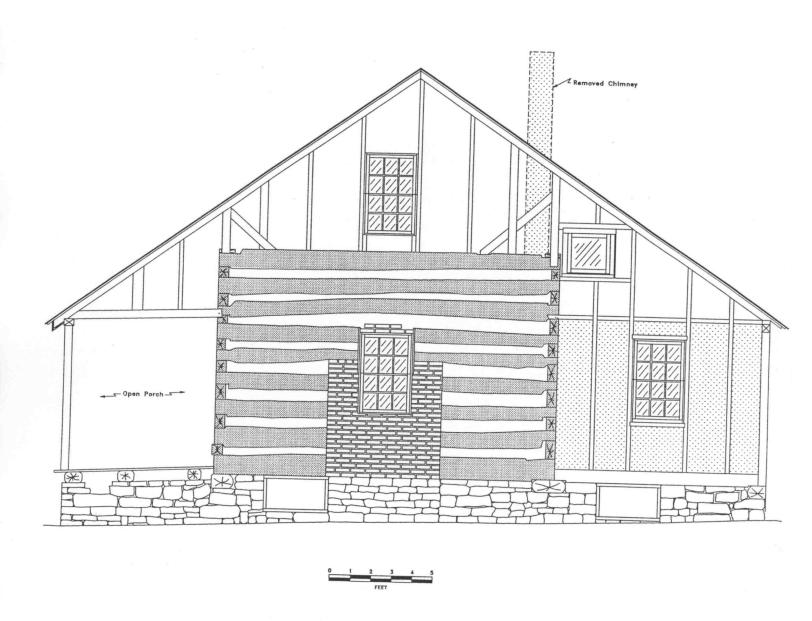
East elevation of the Allard House, 1995. Areas of light shading are infilled with brick nogging.
